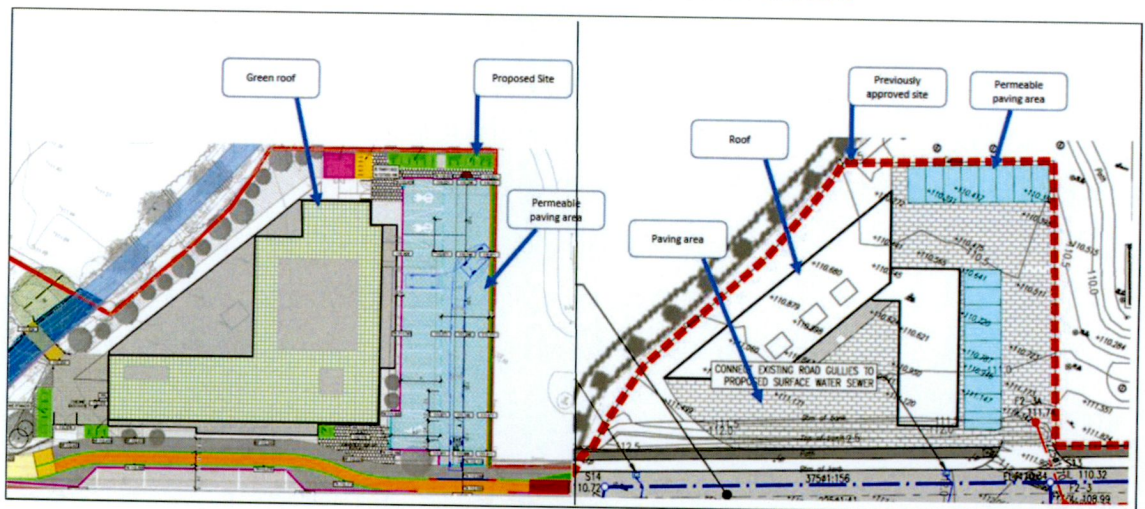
Proposed and Permitted roof area and pavement finishes
